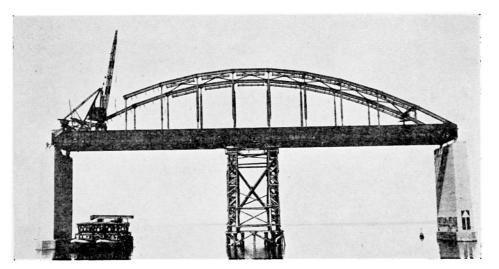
Storstrom Bridge. Plate girders of navigation span assembled in two halves by floating crane and connected on temporary trestle. Arch rib and hangers erected by travelling crane
